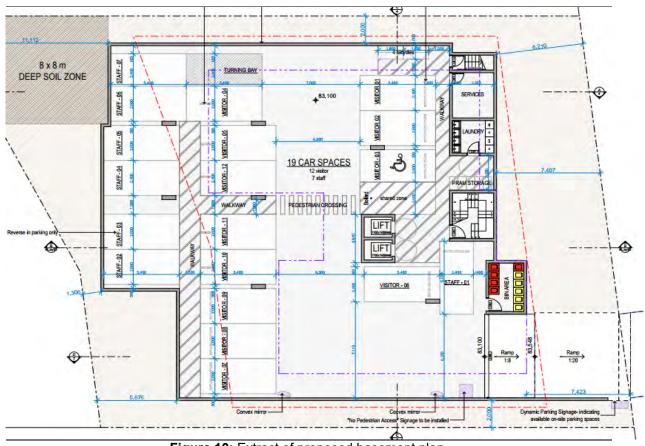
Extract of proposed basement plan. Source: Designcorp Architects, 25 June 2020
